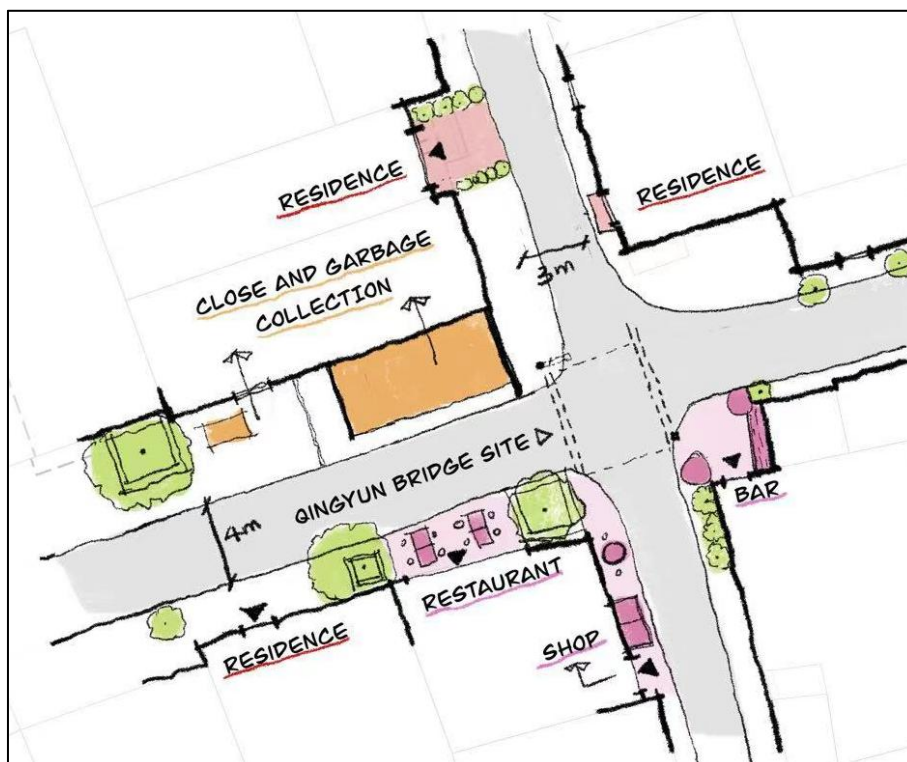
10 Current Conditions at Qingyun Bridge(Source: by the author)
